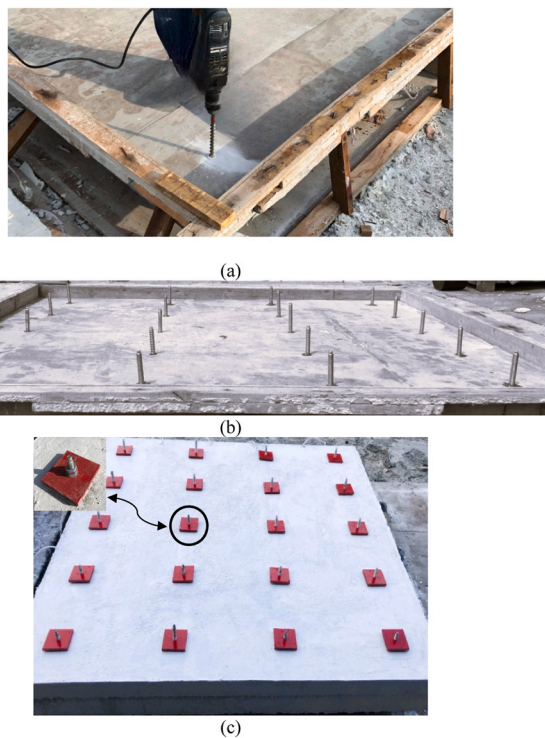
Installation of the mechanical anchorage system (a) drilling holes (b) embedding MEABS (c) fastened the carbon steel plates and nuts.
